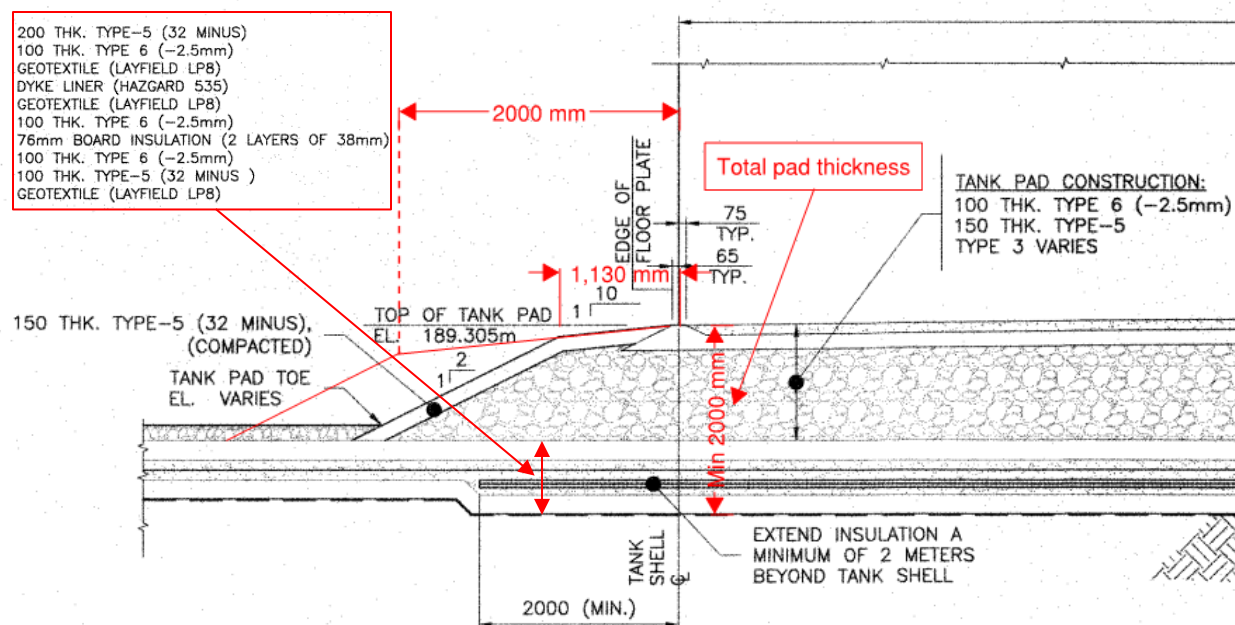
Recommendations for Tank Farm Pad at Mary River Mine Site (recommendations are highlighted in red)
